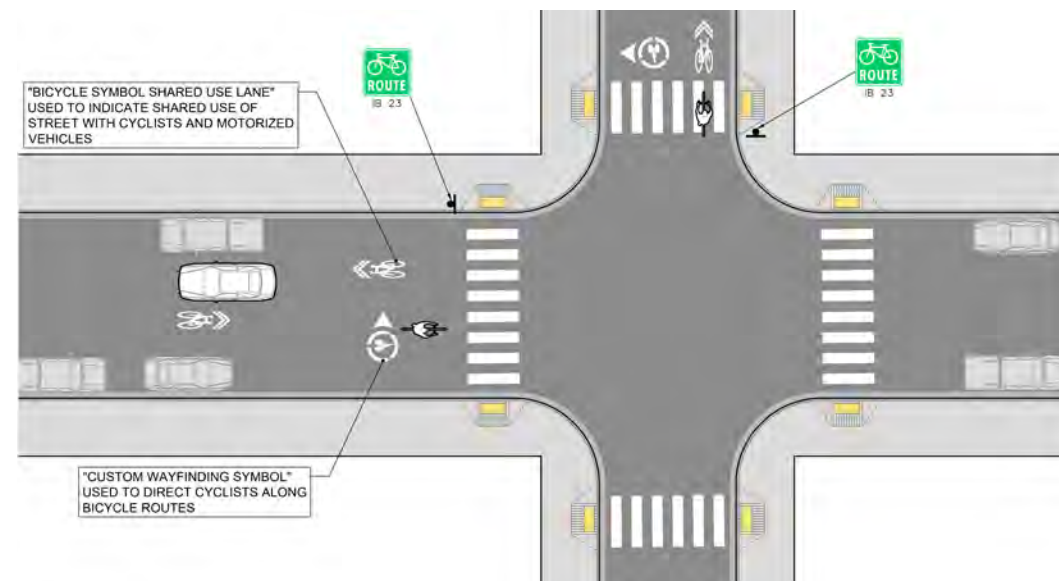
NEIGHBOURHOOD BIKEWAY TYPICAL PAVEMENT MARKING LAYOUT
